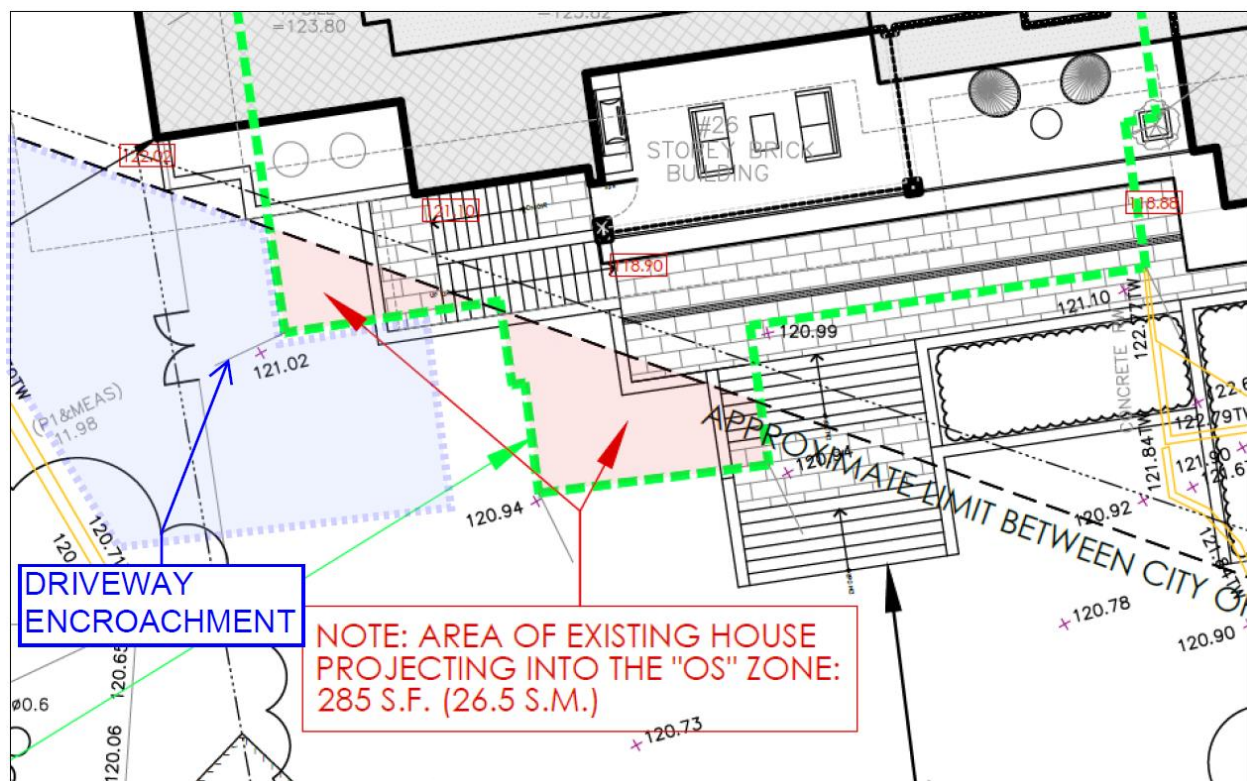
FIGURE ONE: ENCROACHMENT OF EXISTING DWELLING
